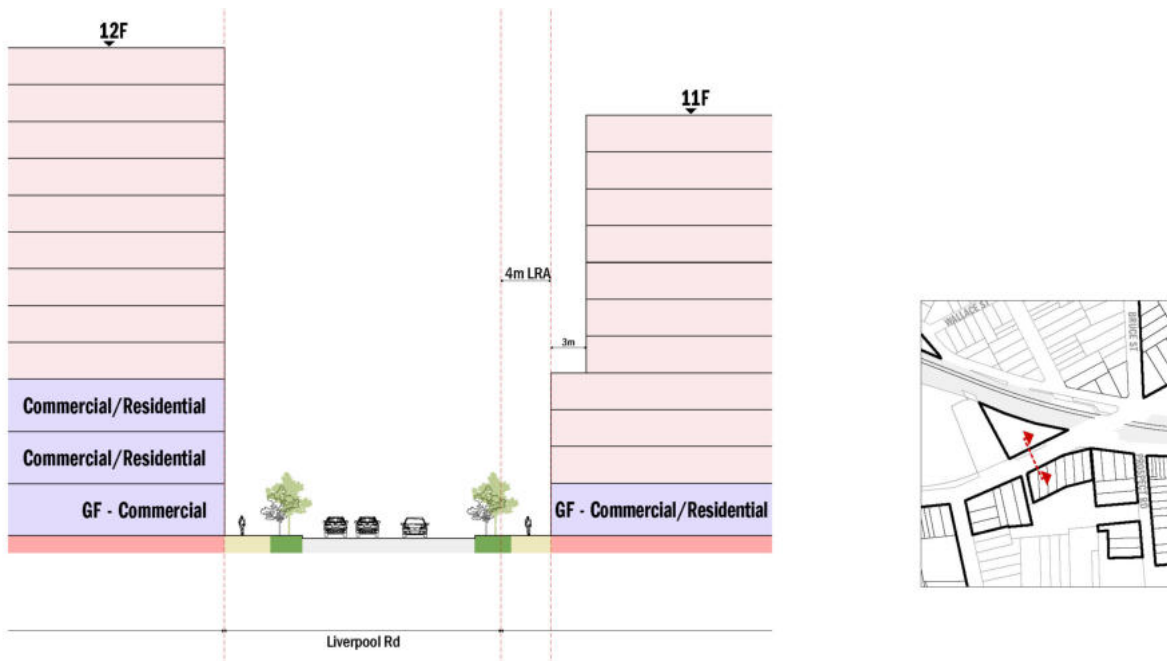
Ashfield East – Liverpool Road between Prospect Road and Victoria Street Section
